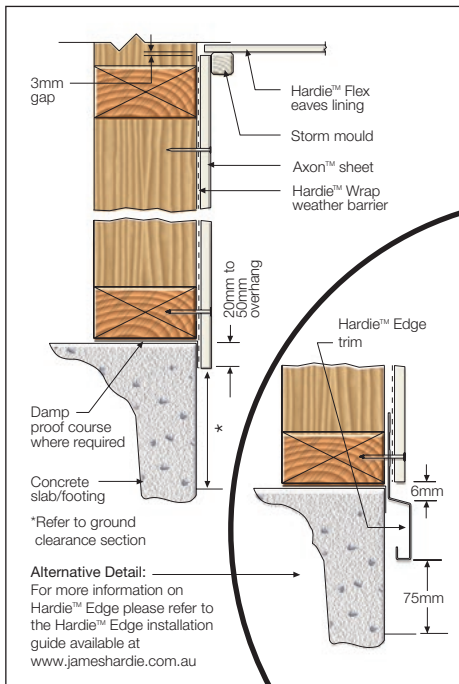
SLAB/EAVE JUNCTION DETAIL
